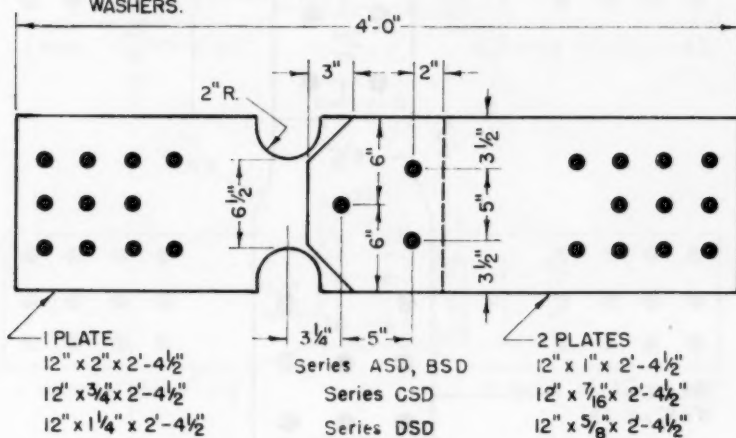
SPECIMENS FOR FATIGUE TESTS OF BOLTED STRUCTURAL JOINTS, SERIES X, ASD, BSD, CSD, AND DSD
